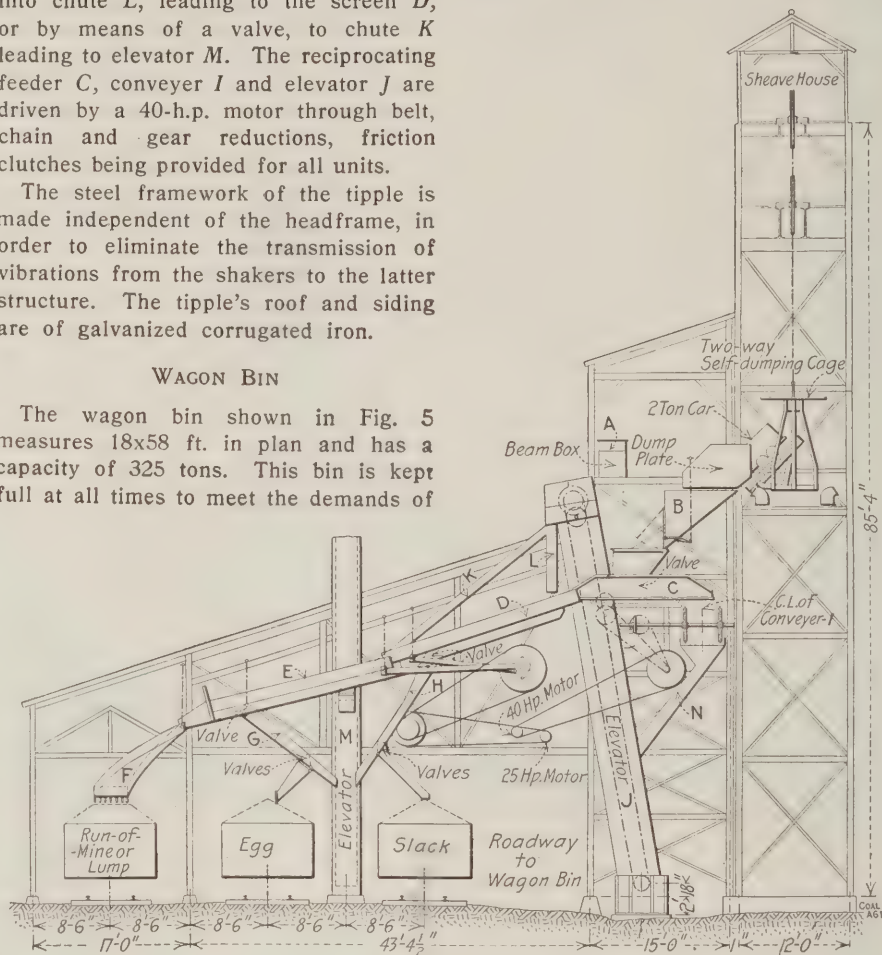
LONGITUDINAL ELEVATION OF TIPPLE
